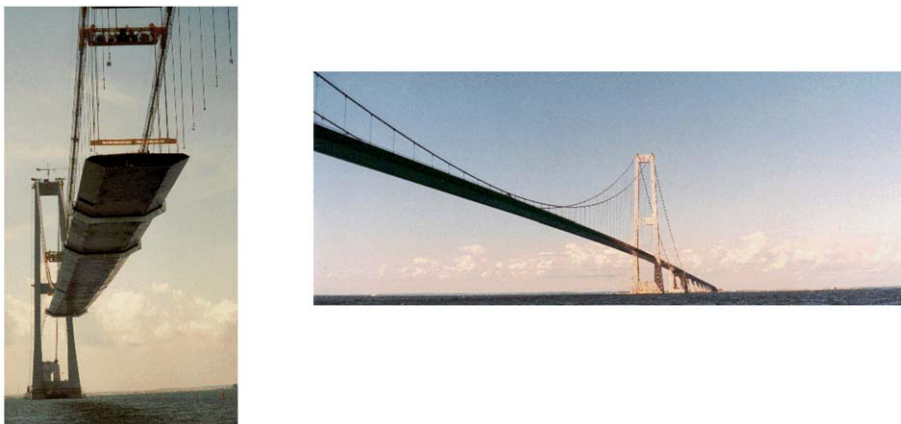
The box-girder deck of the Great Belt East Suspension Bridge.
